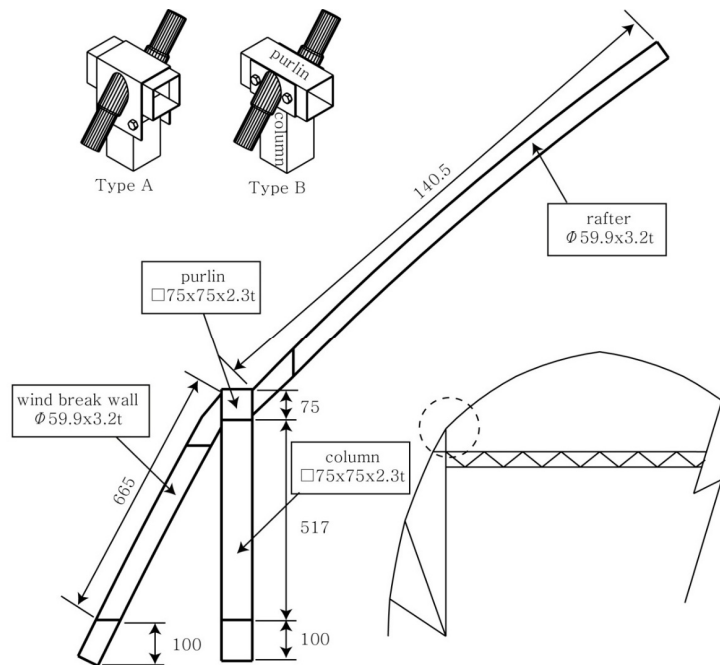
Detail view of column-rafter-purlin connection specimens.
